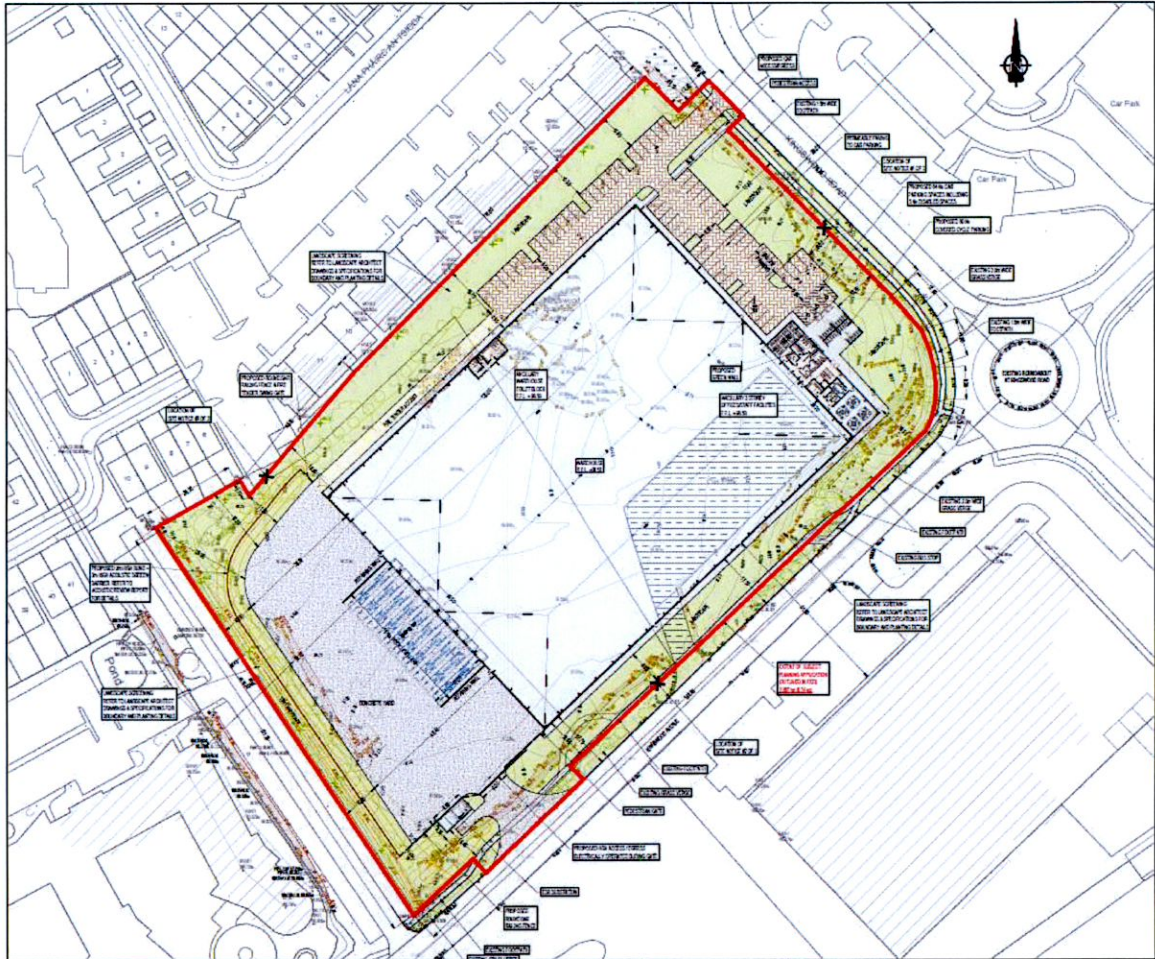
Site Plan (Drawing No.: D1736 D2)
